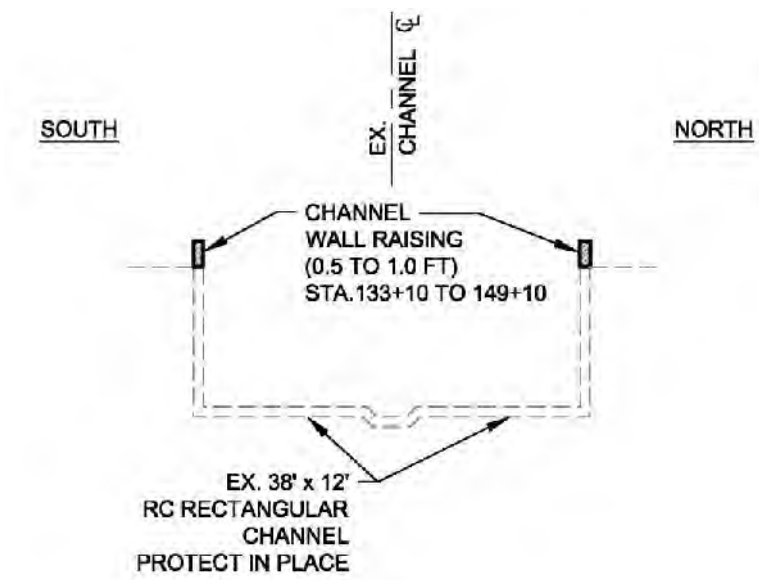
Typical Section for Channel Wall Raising (Alt3B)
